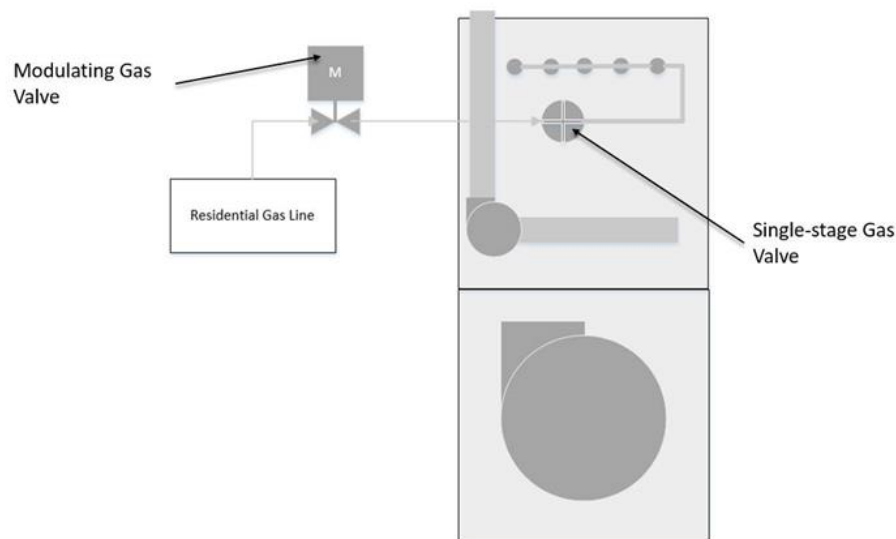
Schematic of the Modulating Valve for Single-stage Furnaces Installation
